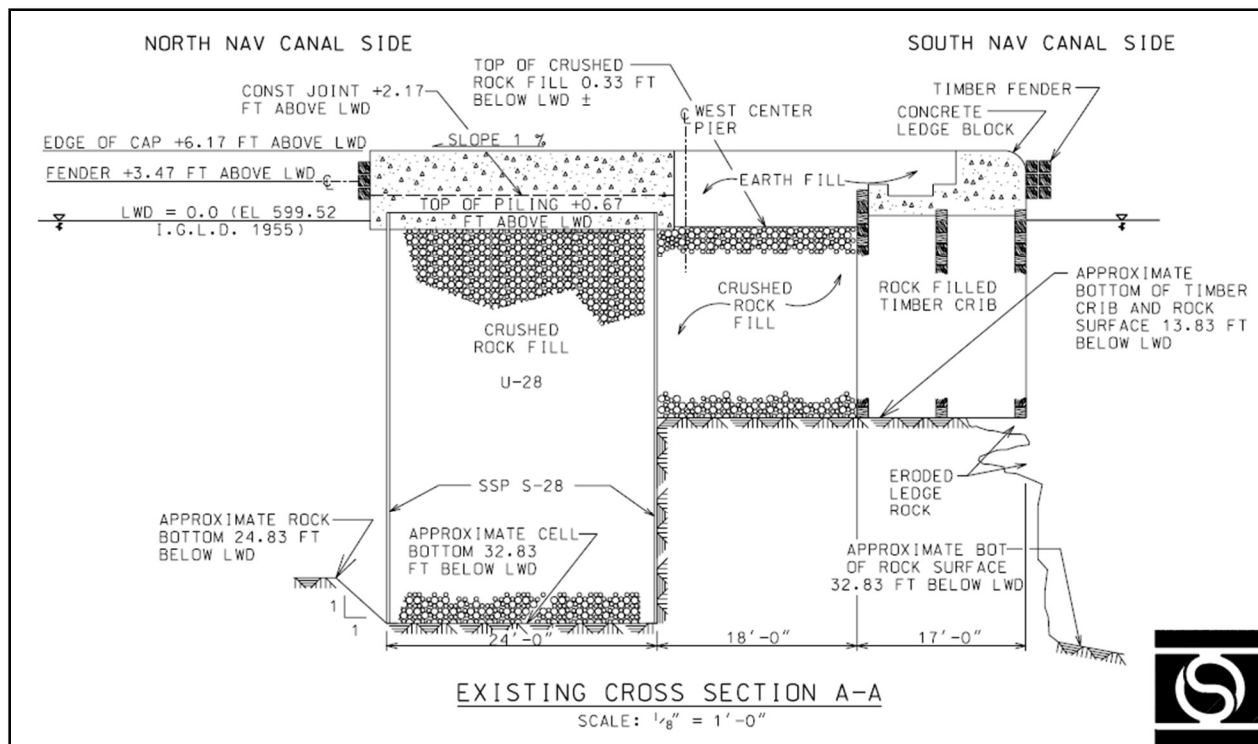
1994 Repair Drawings - Cross Section (2020 Strike Location)
